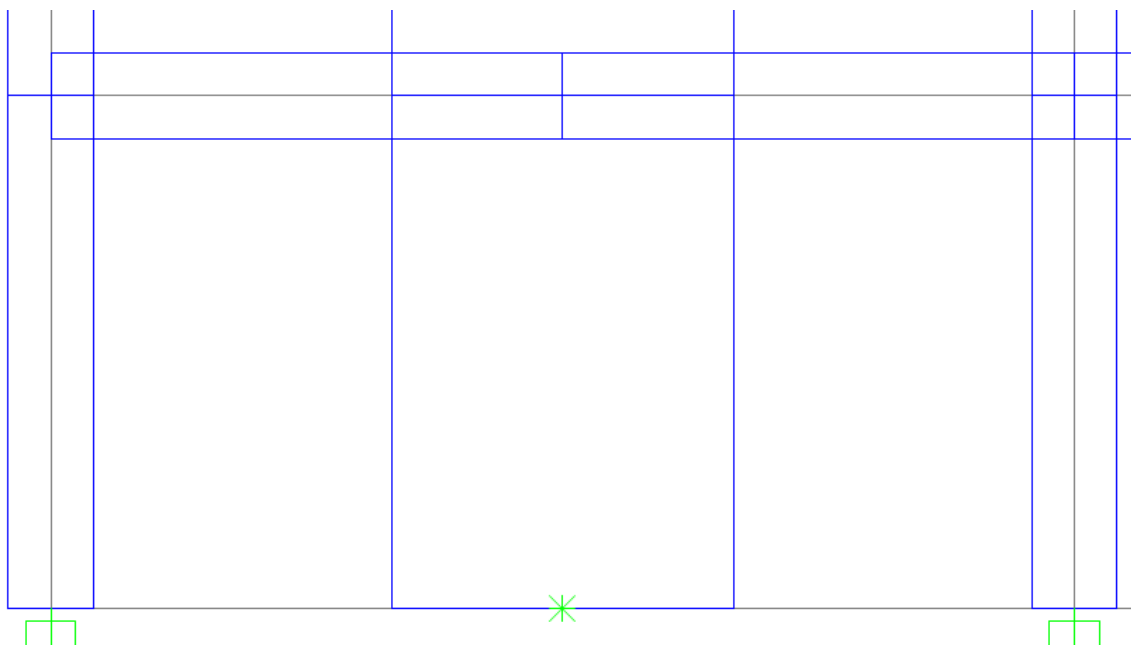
Visualization of the model for a reinforced concrete shear wall in extruded mode, showing the superposition of the walls with the existing beams, then modified to account for the wall’s stiffness (“B50x30 wall” sections).
